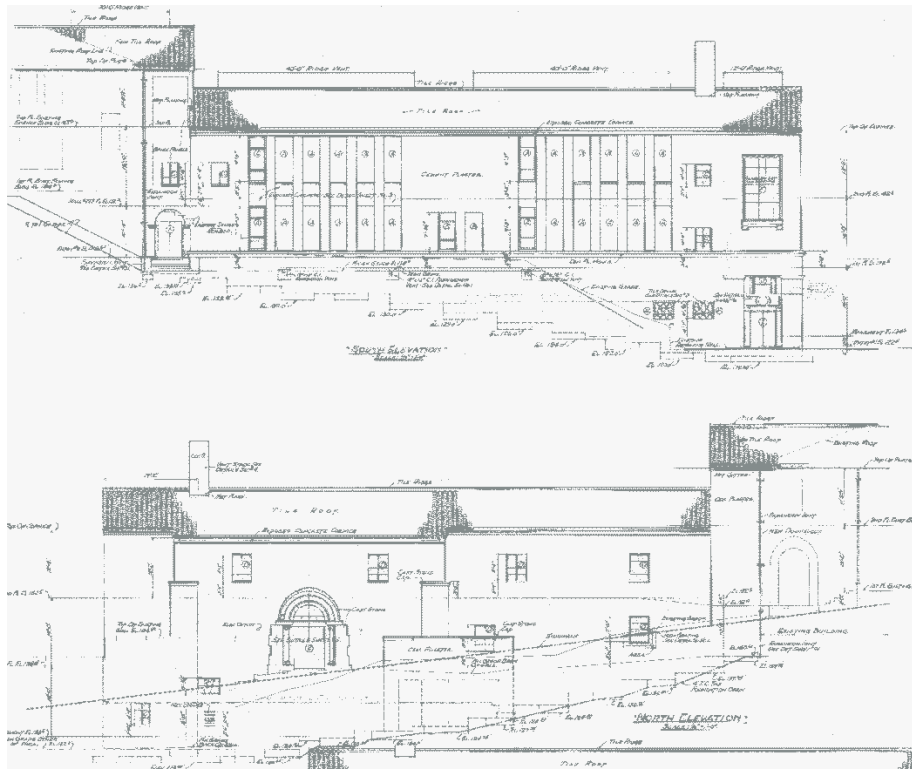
Elevations showing north and south (upper) and north (lower) façades of Science Building (Woods Hall) Annex
